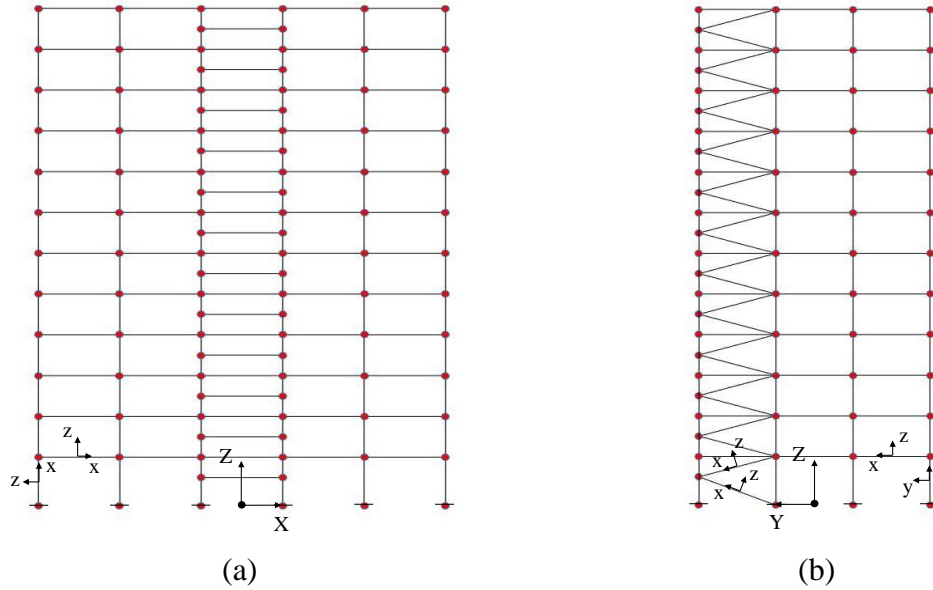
Structural model of the benchmark building (a) XZ plane view (b) YZ plane view.
